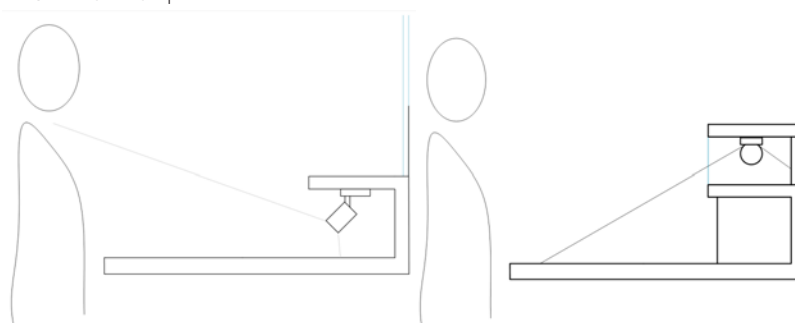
Renovation plan: add spots (left), Renovation plan: add diffuse bright light (right)
